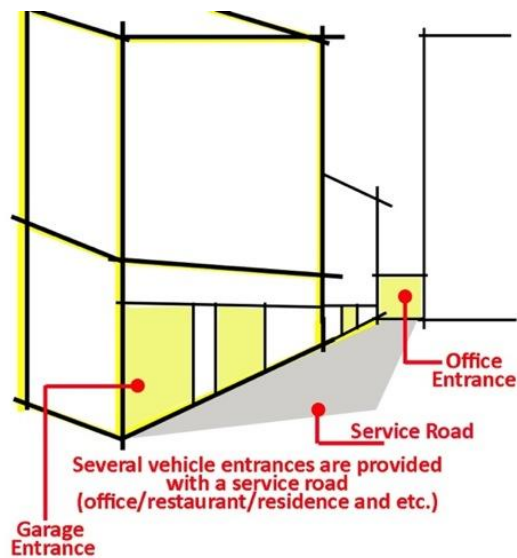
Site servicing and vehicular access provided within and behind the building (Adapted and Re-drawn; Tall Building Design Guidelines, 2013)
